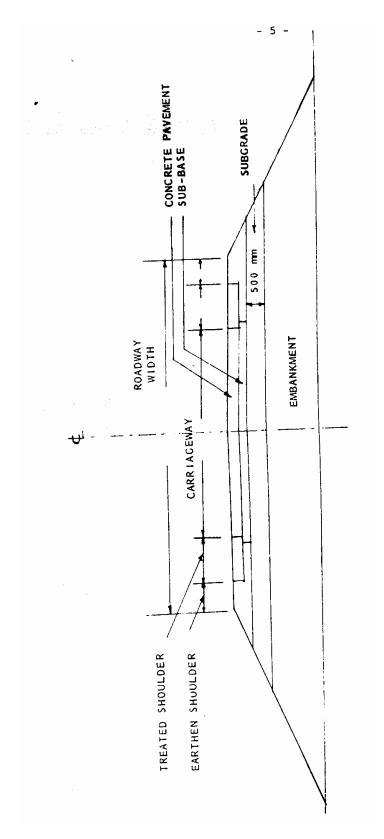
Terms used in the specifications to describe road cross-section elements with a concrete pavement
